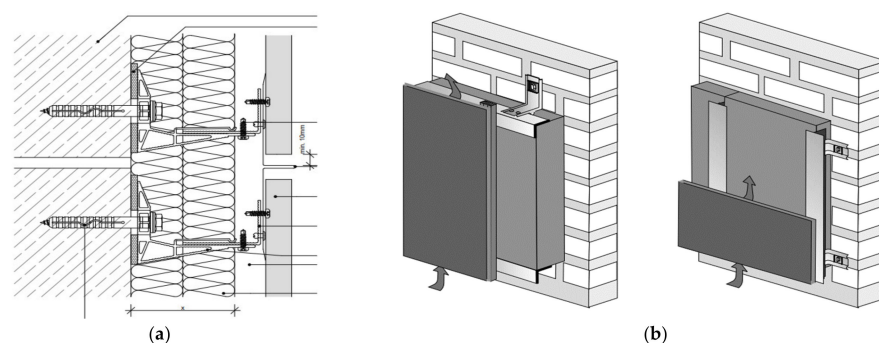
Example of a ventilated façade concept. (a) Anchoring a suspended façade; (b) the principle of operation of a ventilated façade [11].
